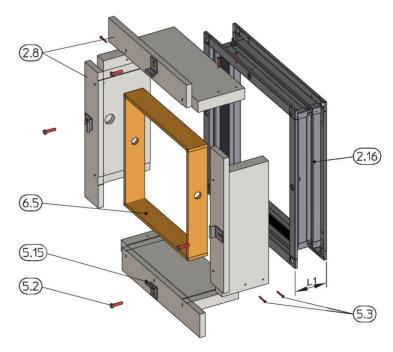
Installation kit E1/E2 for dry mortarless installation into solid walls
